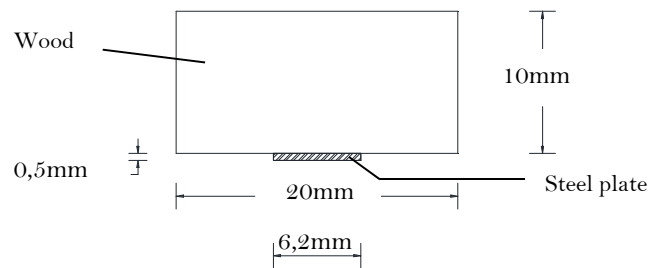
Cross section dimensions of a steel plate reinforced wood beam
